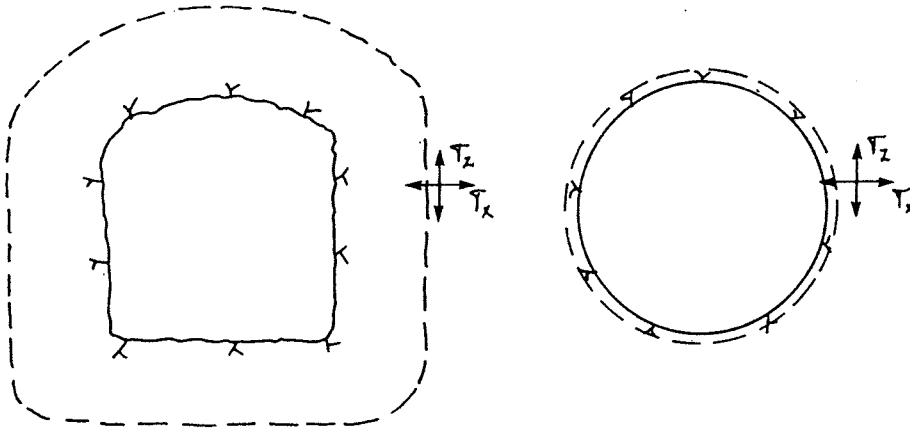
Disturbed zone around a drilled and blasted tunnel
